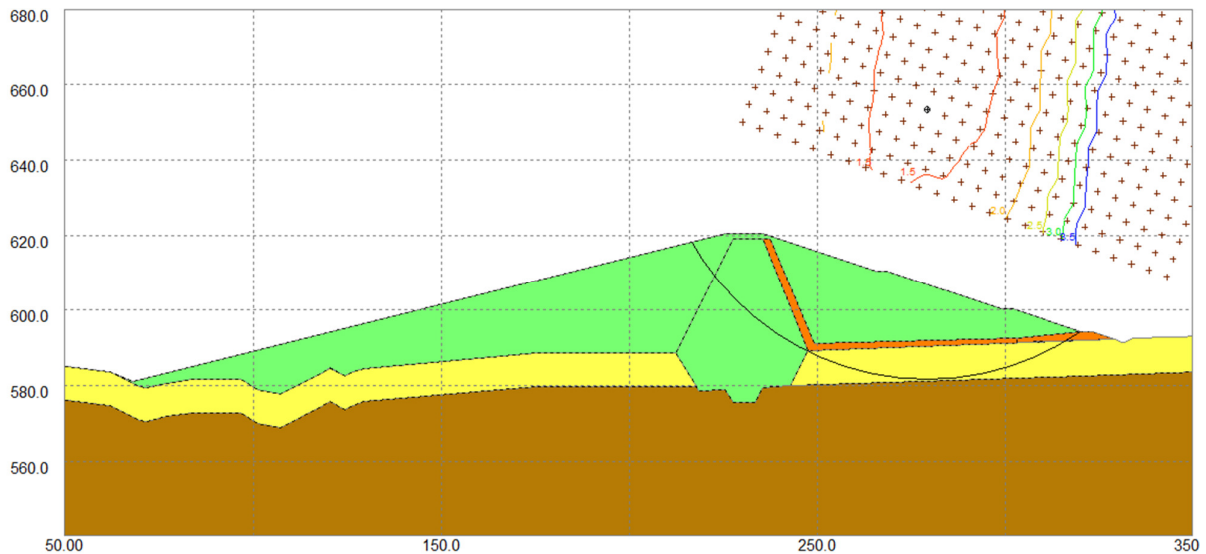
Final Slope geometry used – 1:4 upstream, 1:3 downstream slopes (Run 14 in Appendix B)
